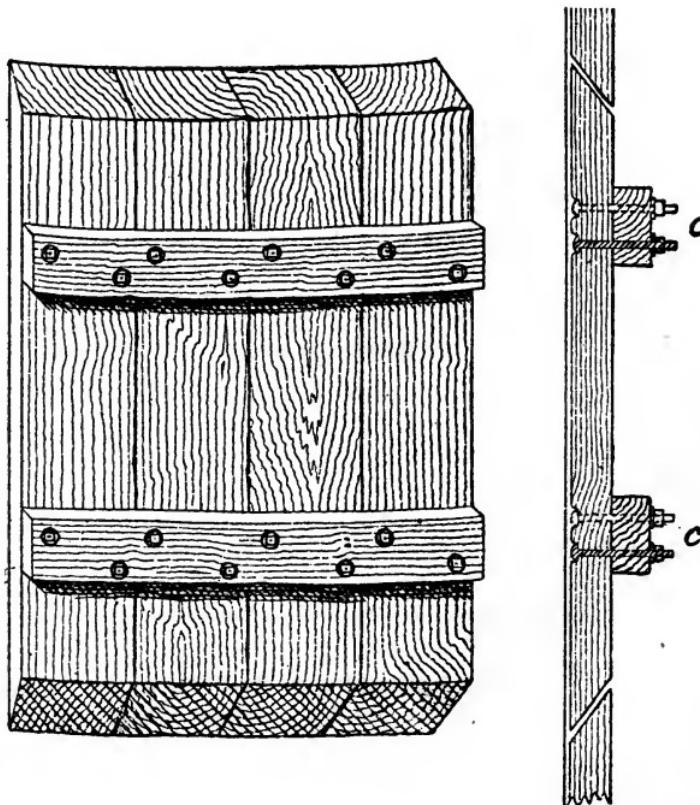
Appearance of door in stave silo after being sawed out, and side view in place. The opening is largest on the inside of silo. (Clinton.)
